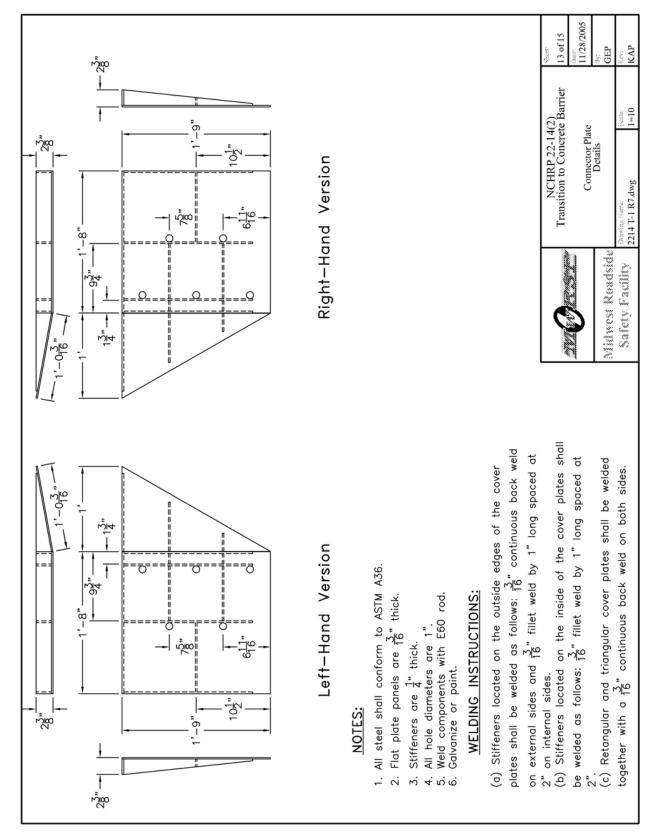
Approach Guardrail Transition to Concrete Barrier Design - Connector Plate Details (English)
